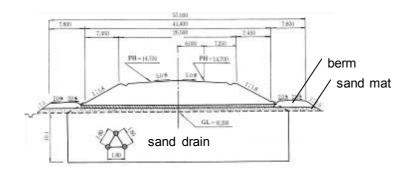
Cross section of Ebetsu Trial Embankment (Sand drain-treated fill)
